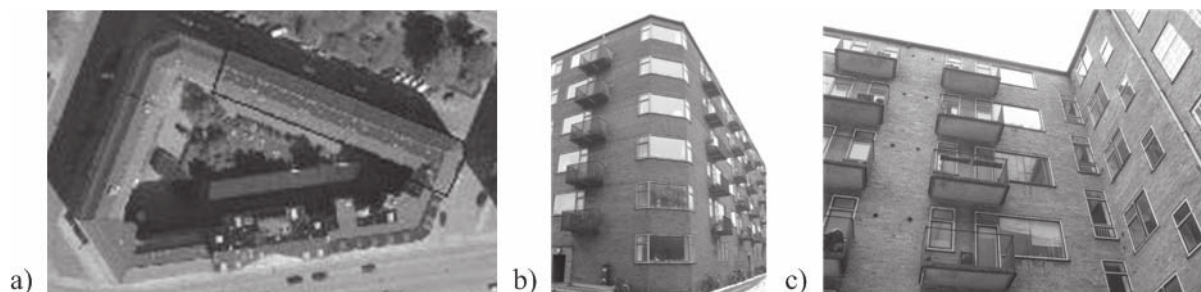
a) plan of the building, marked with a line, b) street facade and c) courtyard facade.
